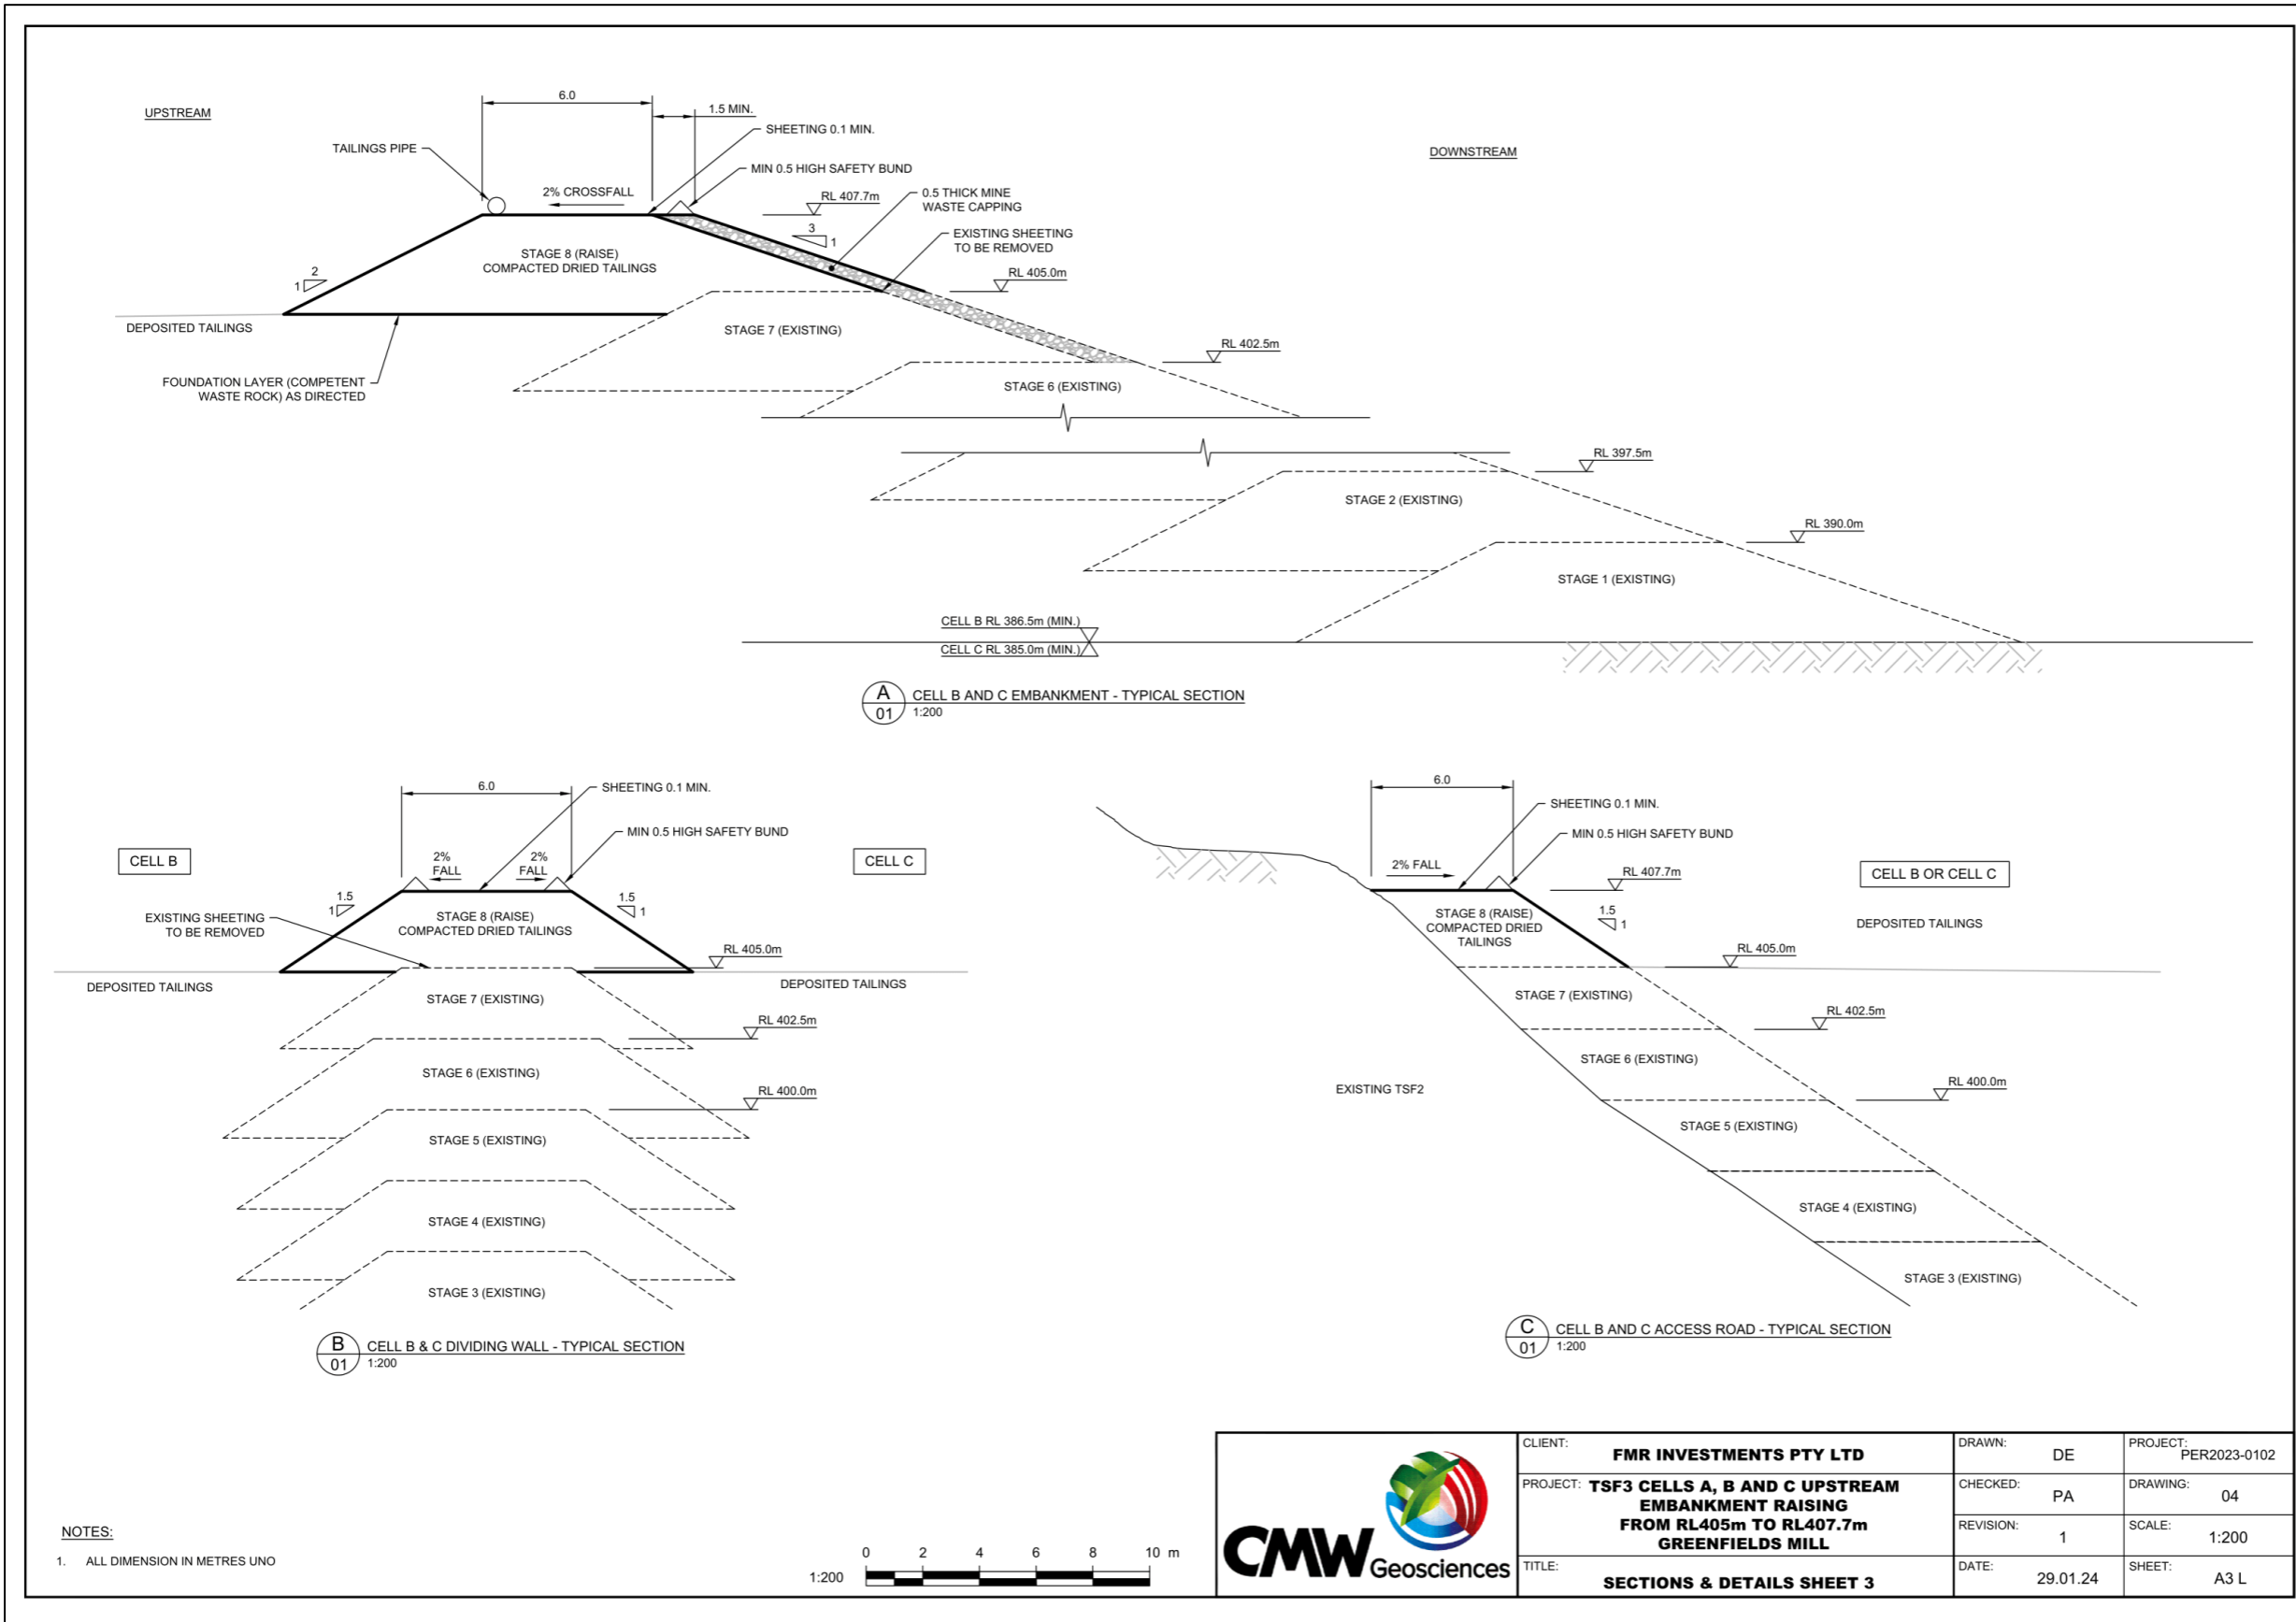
Design drawing (cross-section) for TSF3 Cell B and Cell C Stage 8 embankment raise
